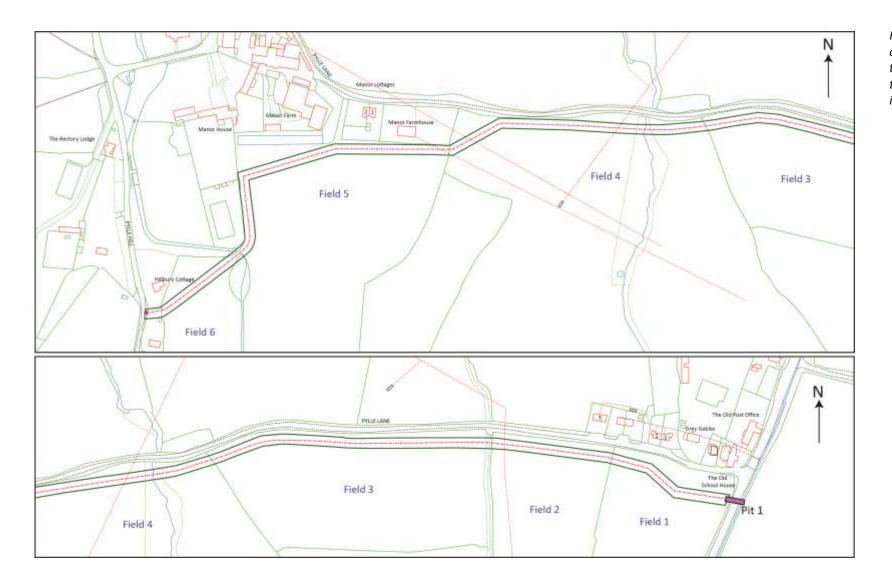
Plan showing the course of the pipeline route (based on the engineering plan supplied to BAL by Bristol Water for information
